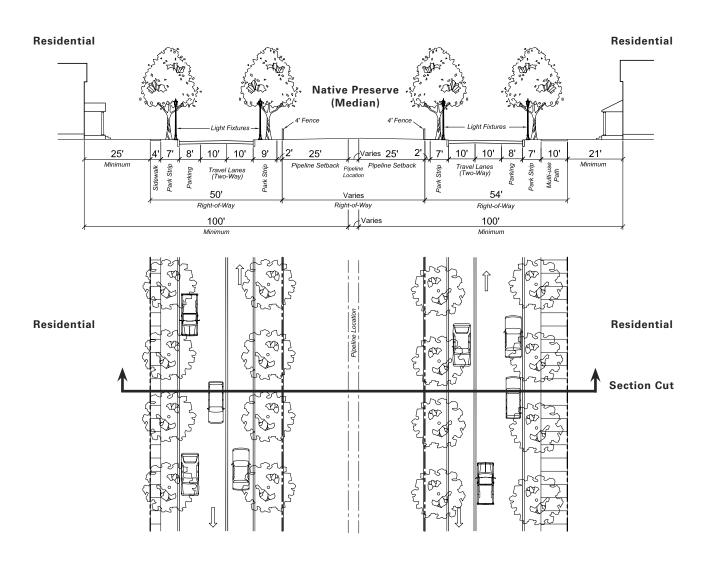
Proposed Section and Plan: Neighborhood Street F
